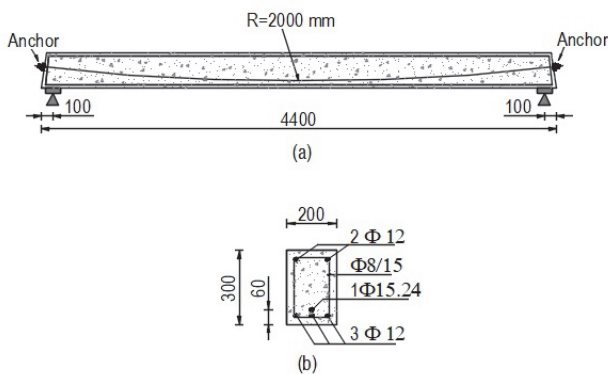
(a) Beam longitudinal section, (b) beam cross-section and reinforcement details (dimensions are given in mm)
